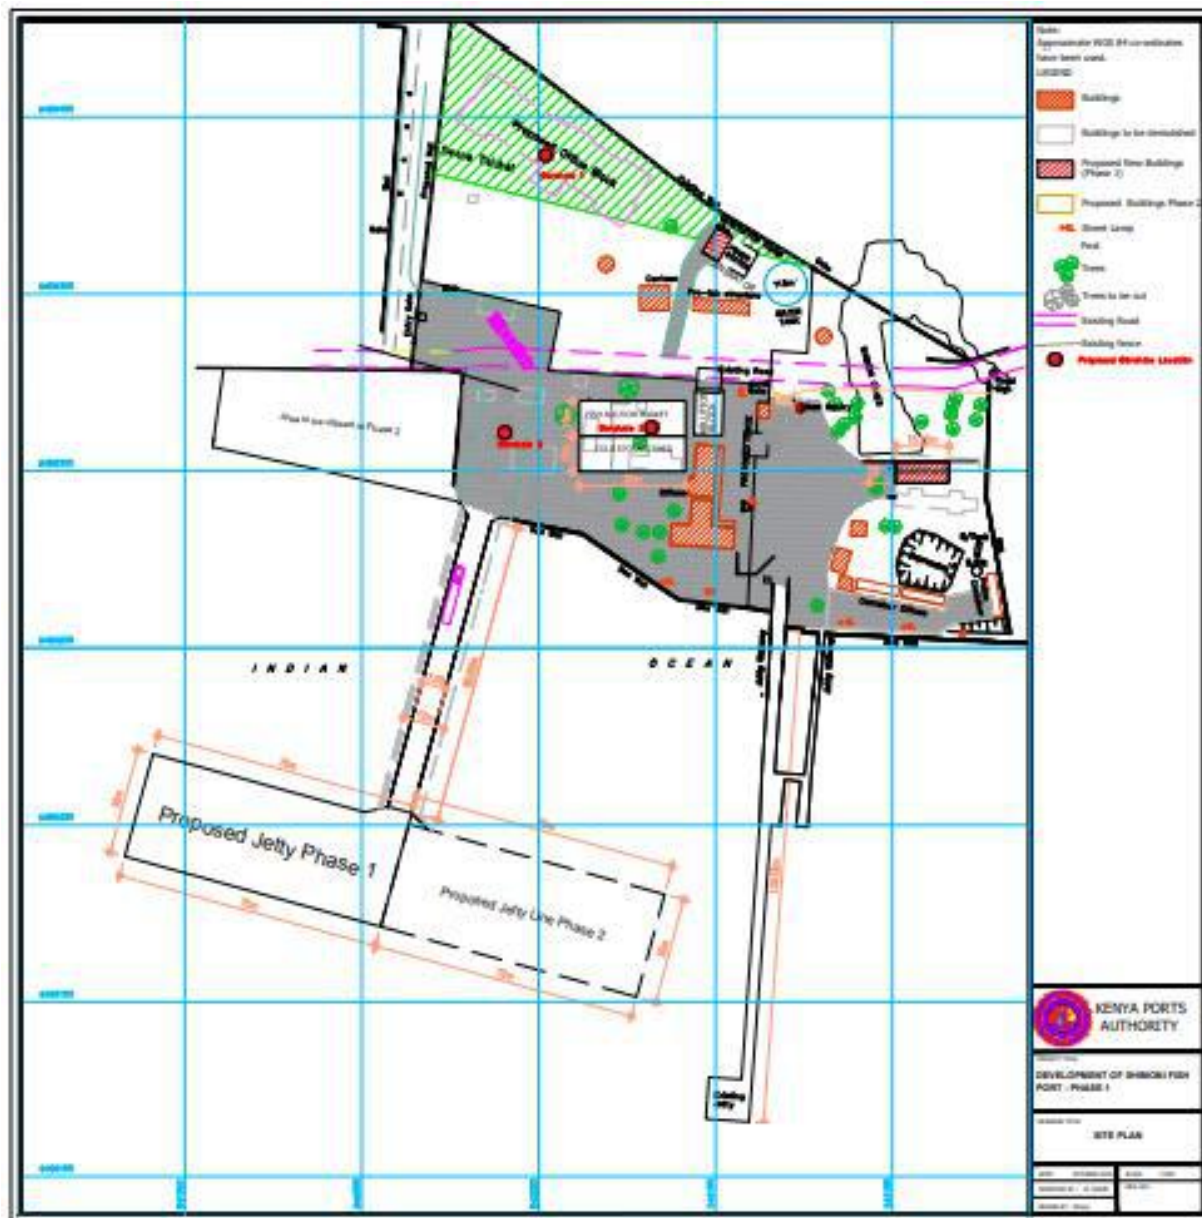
A conceptual draft layout of the proposed jetty (Source: KPA Master plan, 2019)
